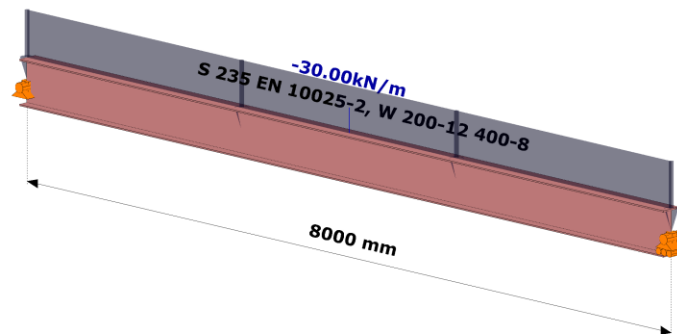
Plated structural member loaded by uniformly distributed load in the vertical plane (welded I section with 200-12 flange and 400-8 web)
